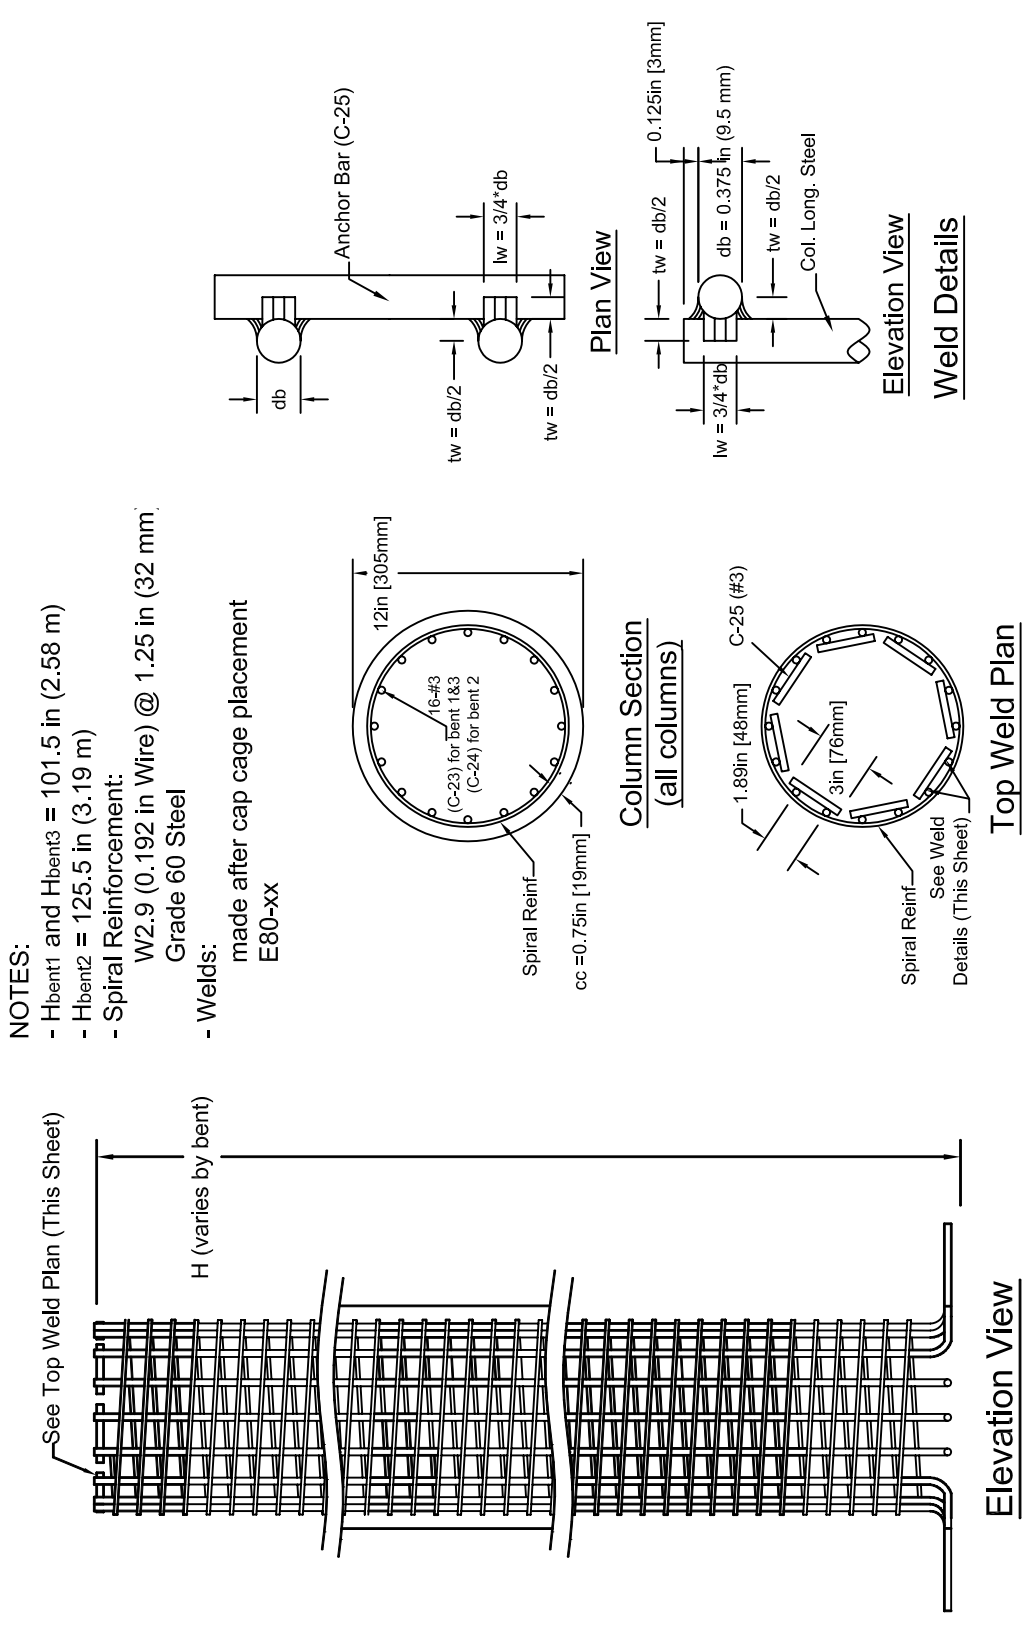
Bridge Plans Sheet 3; Bent Sections.
